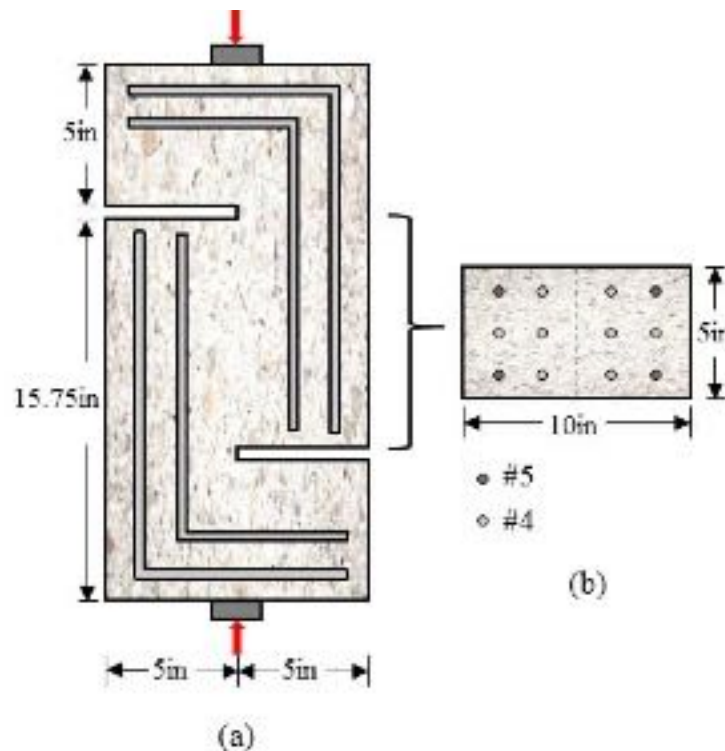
Push-off specimen created by Hofbeck et al. (Hofbeck et al., 1969a) (a) Geometry details, and (b) interface elevation and reinforcement details with no reinforcement crossing the interface
